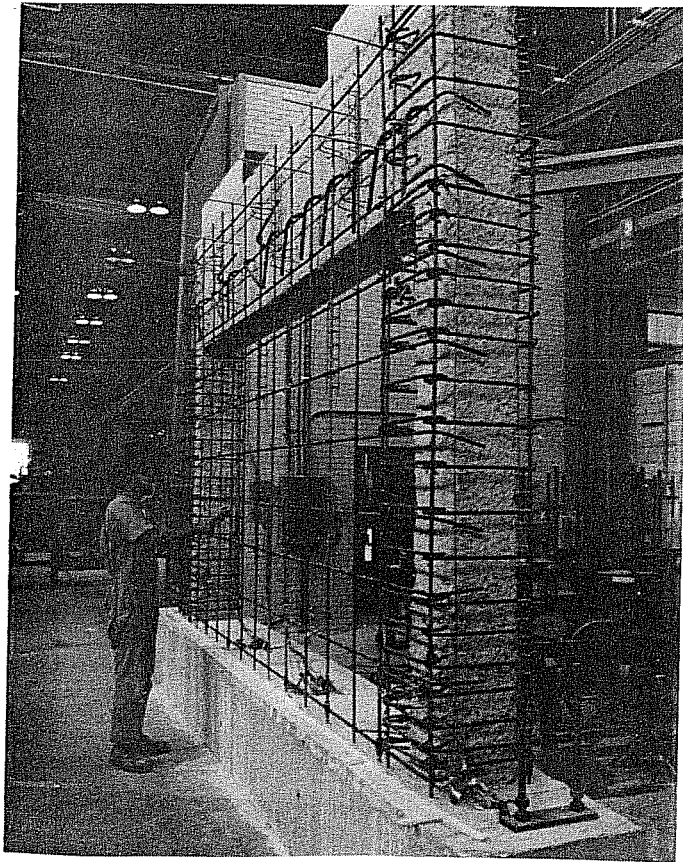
Full view of reinforcing cage of Jimenez's specimen [3].
